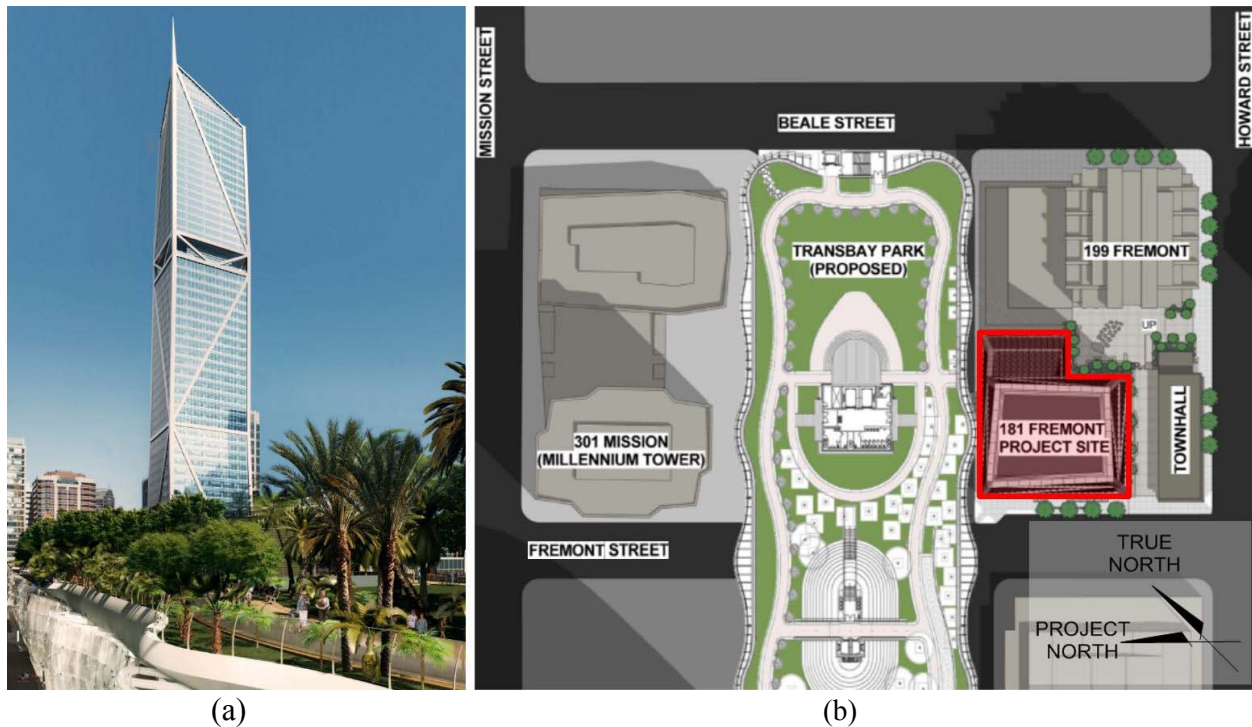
Architectural renderings of the 181 Fremont Tower site: (a) side view, and (b) plan view (used with permission from Heller Manus Architects)
